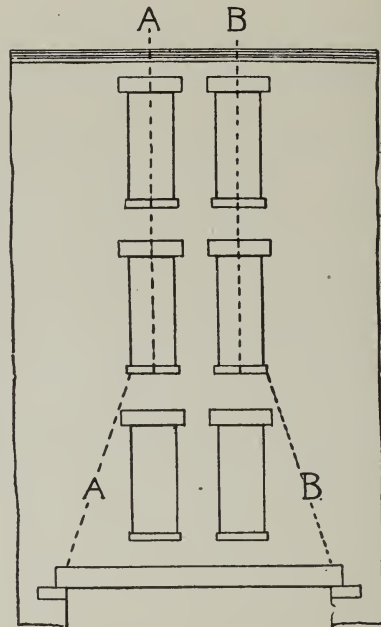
Openings over Girder. Amount of Brickwork Supported.
